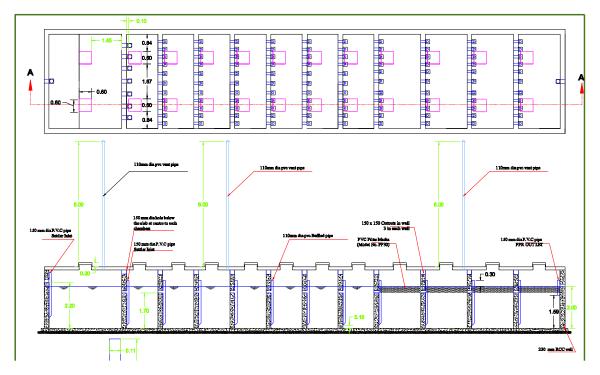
Cross sectional drawings of Waste water treatment plant – DEWATS
